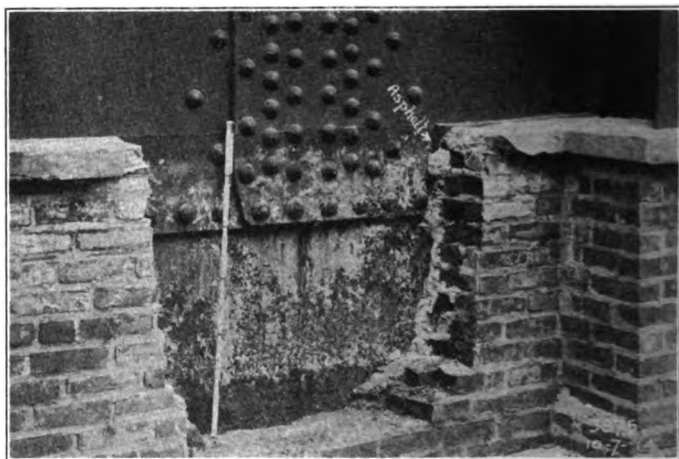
Holder tank plate of open hearth steel with portion of brick and concrete wall removed. Holder built in 1908.
